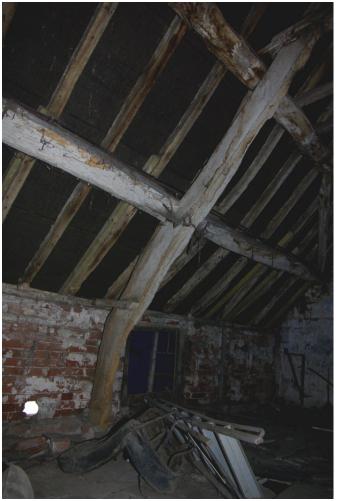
Barn, first floor, south-west room cruck blade Looking south
